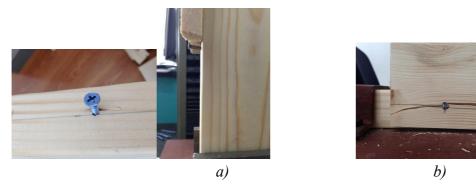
Failure modes of the joints with SPF sheathing: (a) bending of fastener, (b) brittle failure of SPF sheathing panel.
